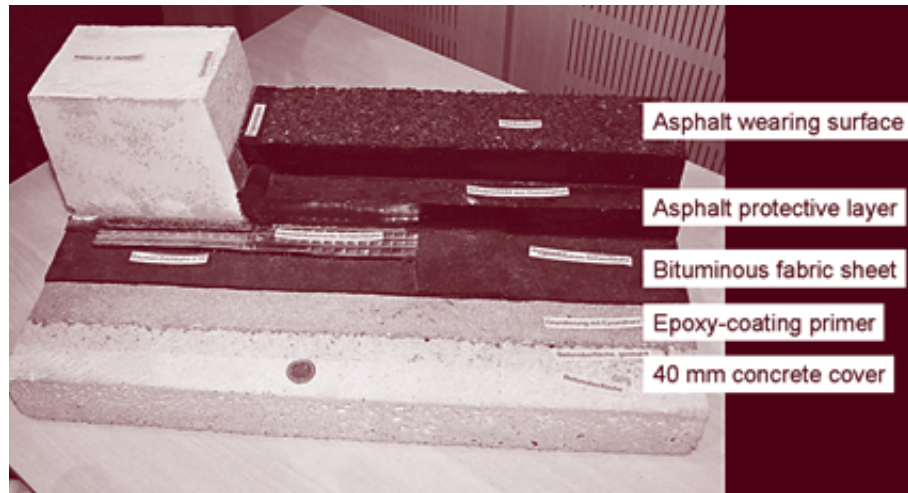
Bridge deck multiple-level corrosion protection system.
